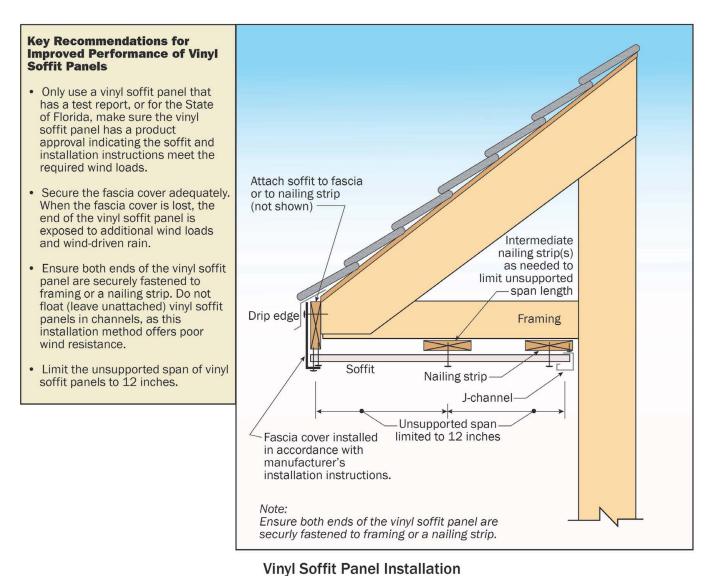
Improving soffits can decrease wind damage to sloped roofs.
